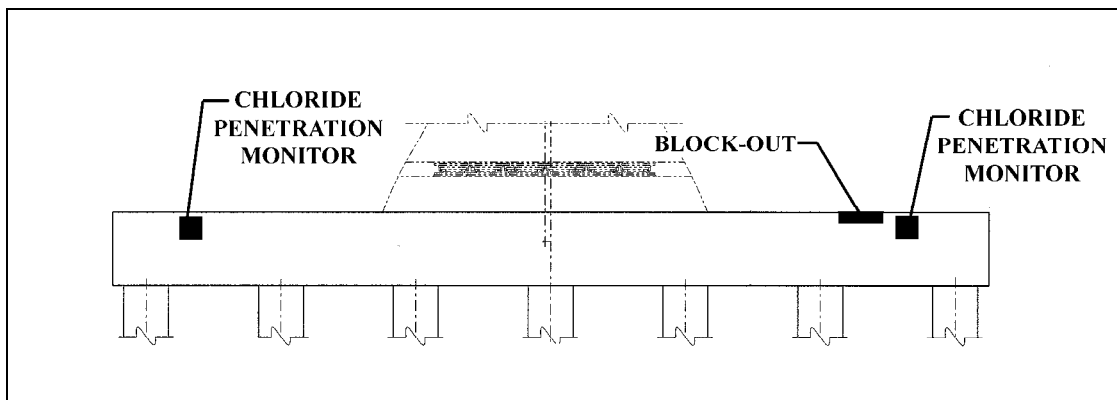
Chloride Penetration Monitor Locations (Elevation View) (Modified IRIB Specifications and Construction Plans)
